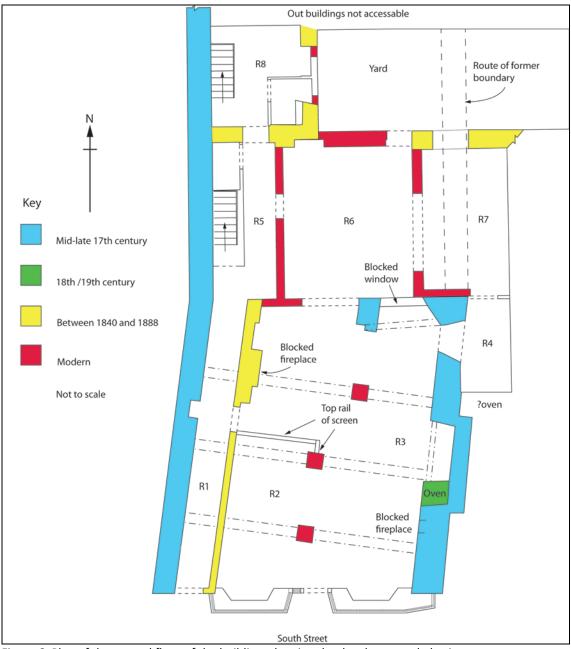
Plan of the ground floor of the building, showing the developmental phasing.
